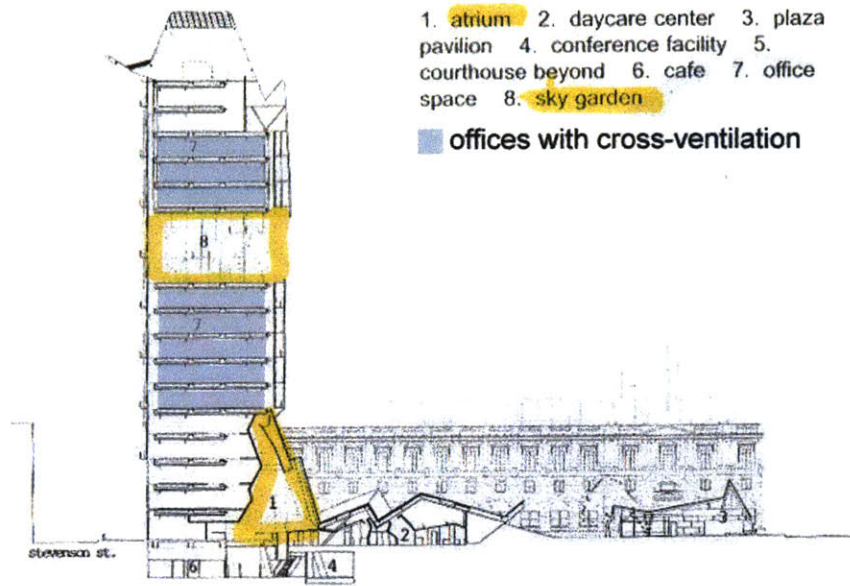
SFFB section drawing shows cross-ventilation above 5th floor (modified from GA document 2002)
